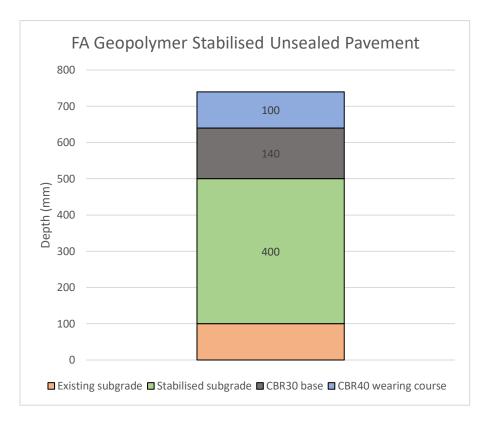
Fly ash geopolymer stabilised unsealed pavement design (Author 2019)
